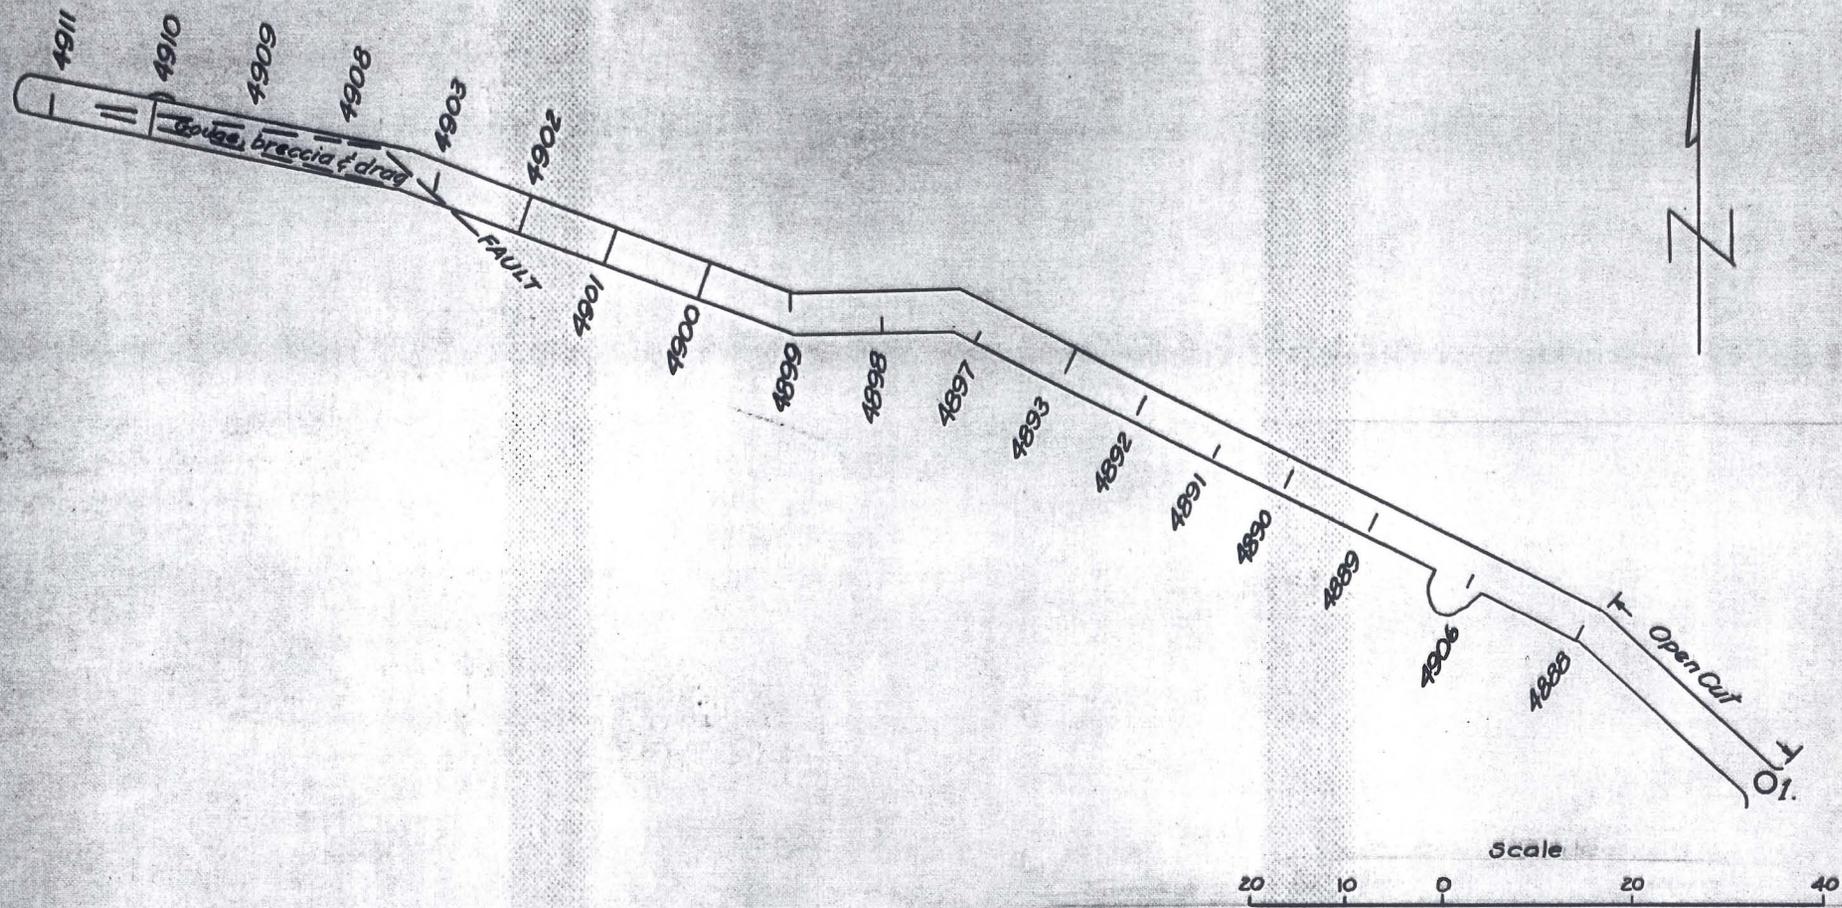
TUNNEL PLAN SHOWING LOCATION OF SAMPLES
